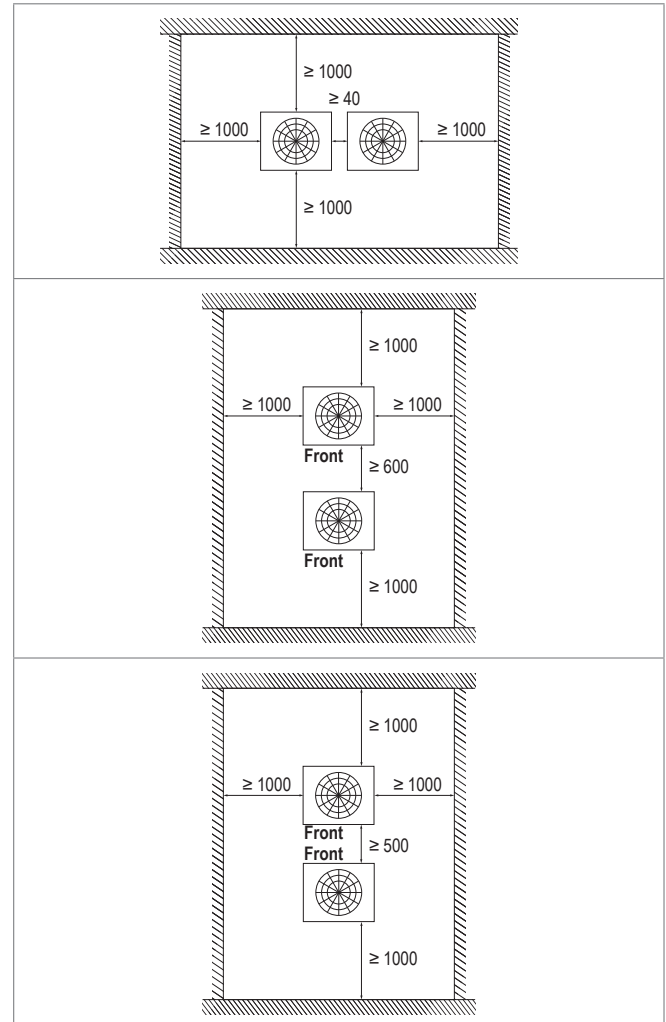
Minimum distances for the heat pump Q (dimensions in mm)
